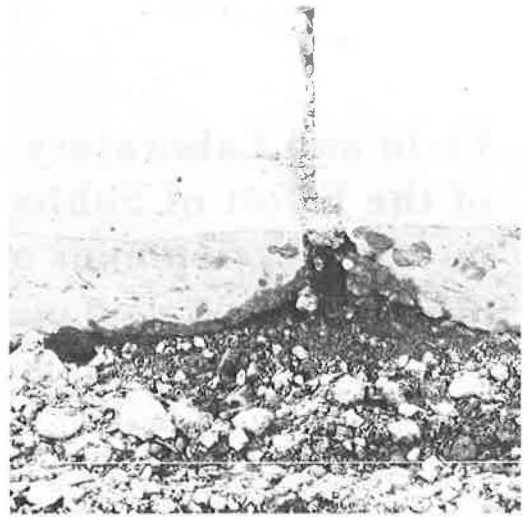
Transverse cross section of pavement in which severe D-cracking has developed. White line shows original bottom of pavement slab, lower half completely deteriorated.
